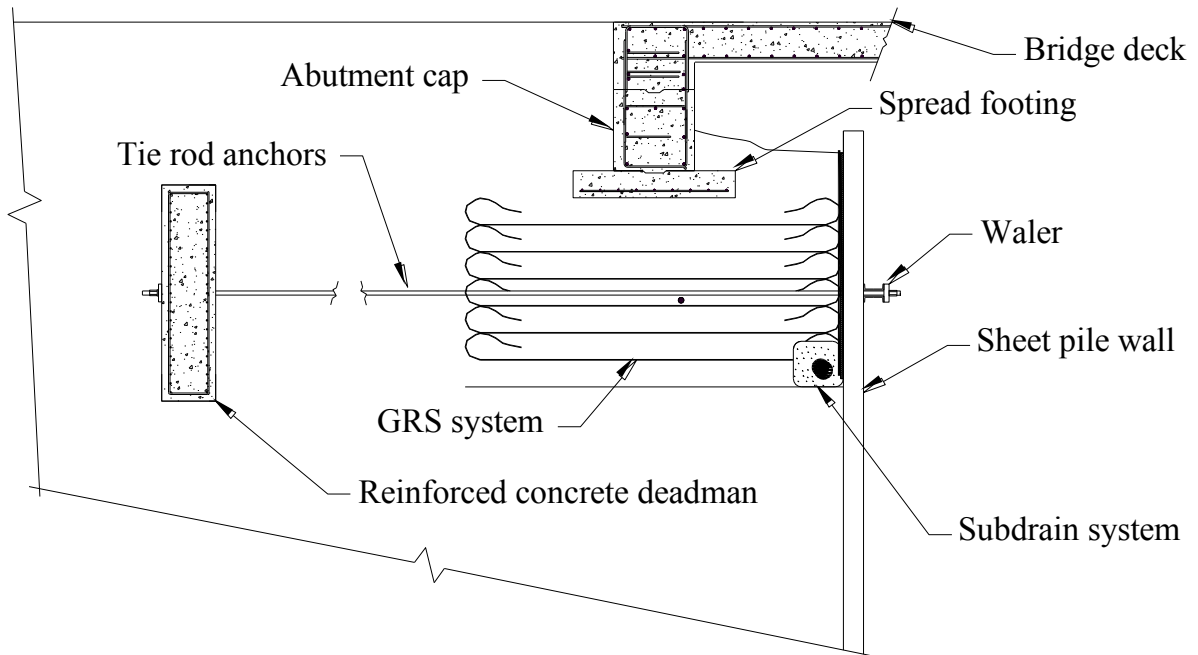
Cross-section of sheet pile abutment foundation system at a bridge site in Boone (Evans et al. 2012)
